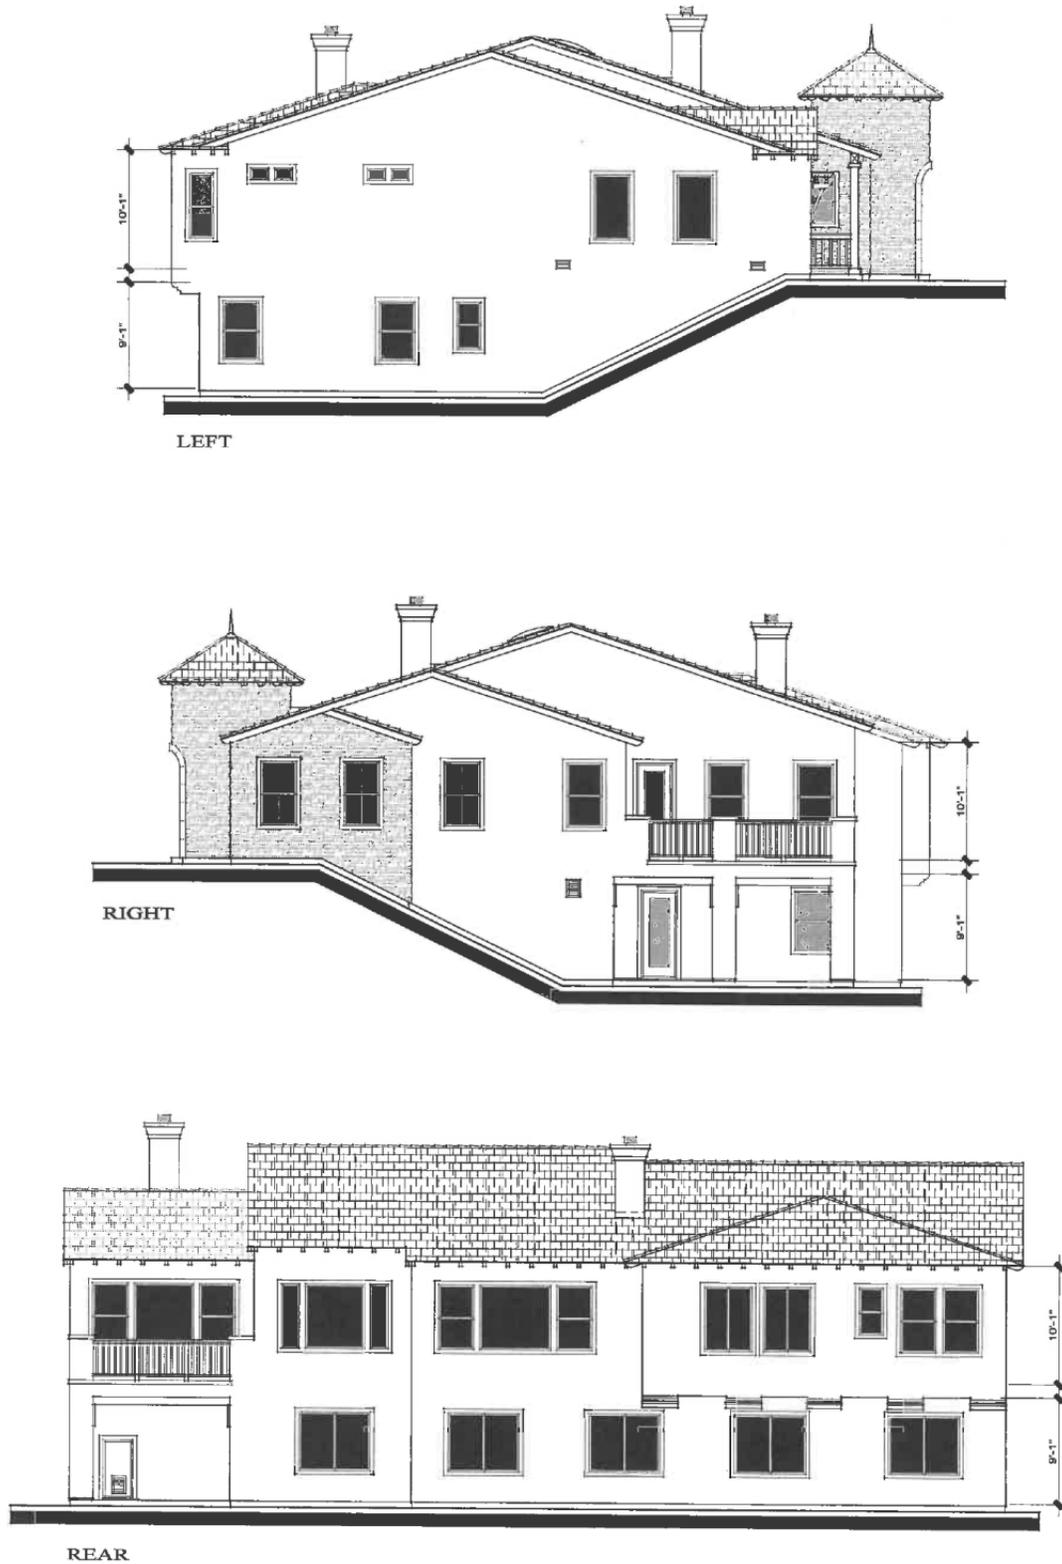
Plan 6 – French Country Style, Other Elevations
